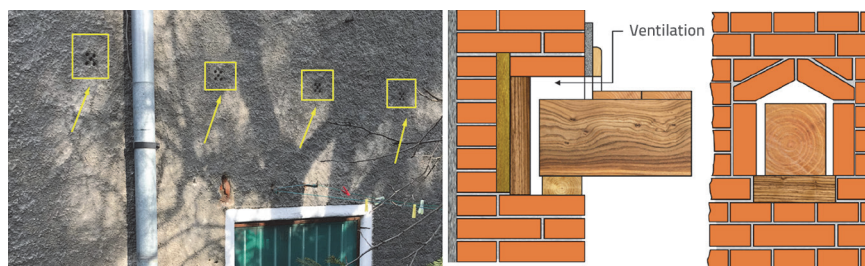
Perforated gypsum elements at the floor structure level on the façade and an example of ventilation
